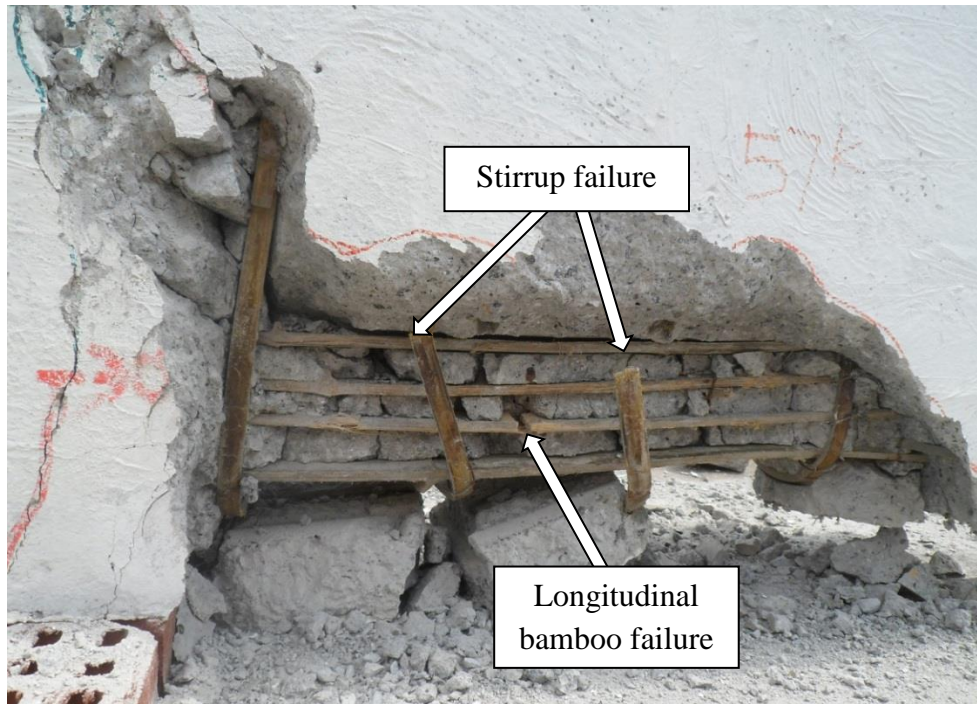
Stirrup and longitudinal failure in back face of beam L3
